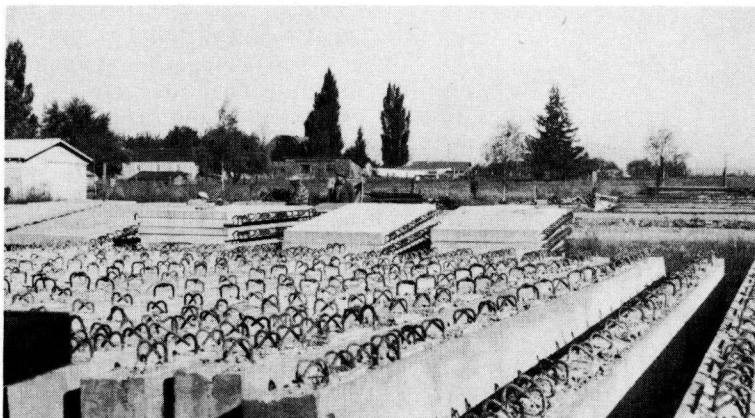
Baker River Bridge - Stringer and Slab Precasts Stockpiled
